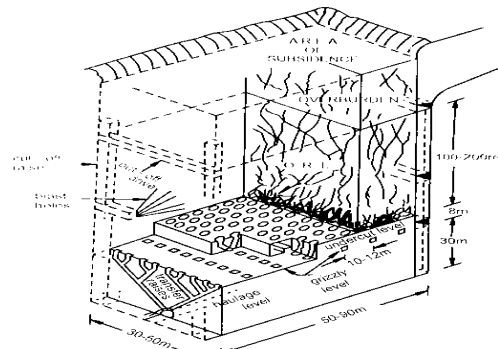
Typical block caving layout drawpoints are 5-6 m apart, centre to centre
